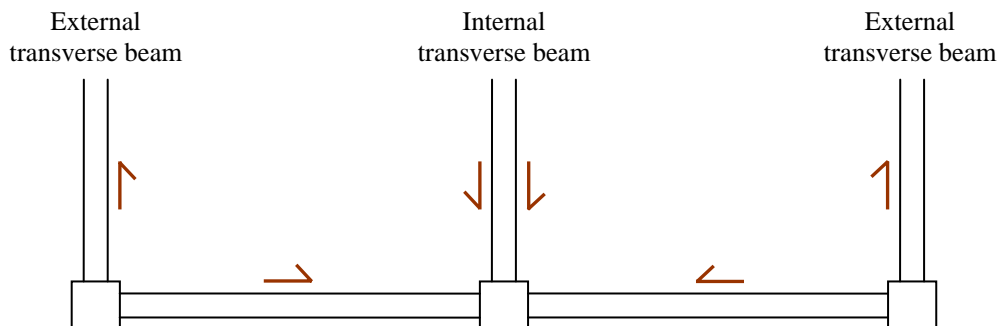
Shear deformation pattern along the beam and floor slab interface
